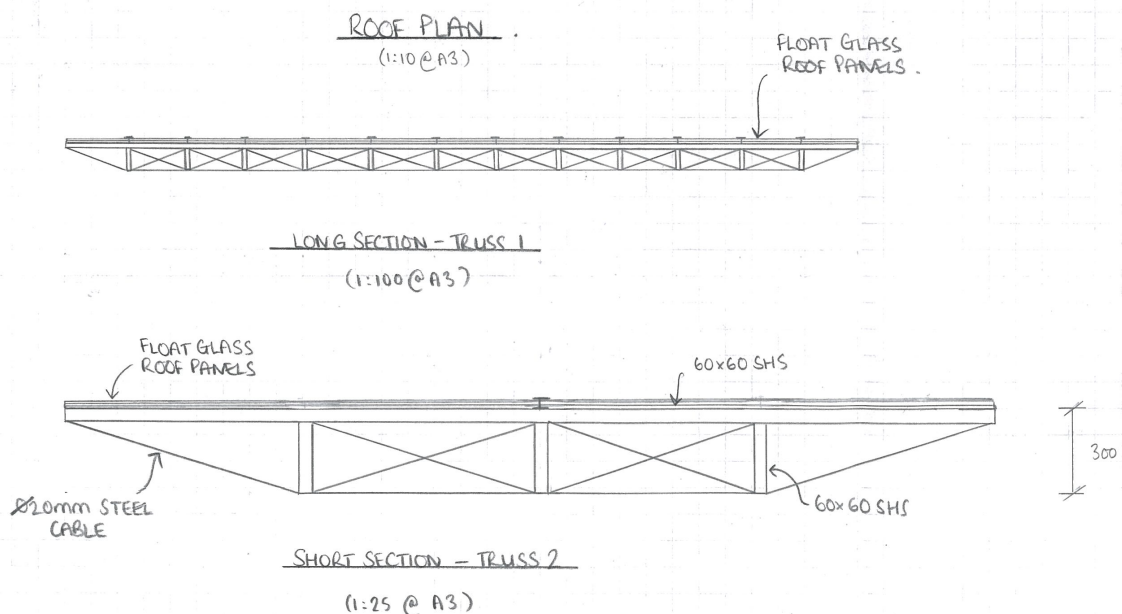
Extract from Price & Myers review of structural options for the Winter Garden, showing the cable truss option, with multiple connection points required within each truss
